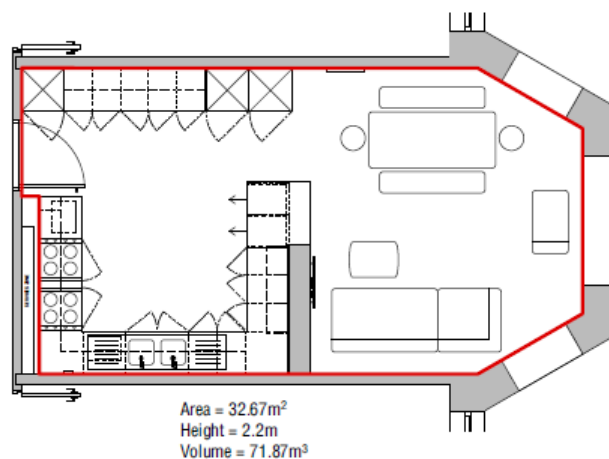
A – Floor Plan - communal Living/ Kitchen/ Dining room.⁶³⁴
